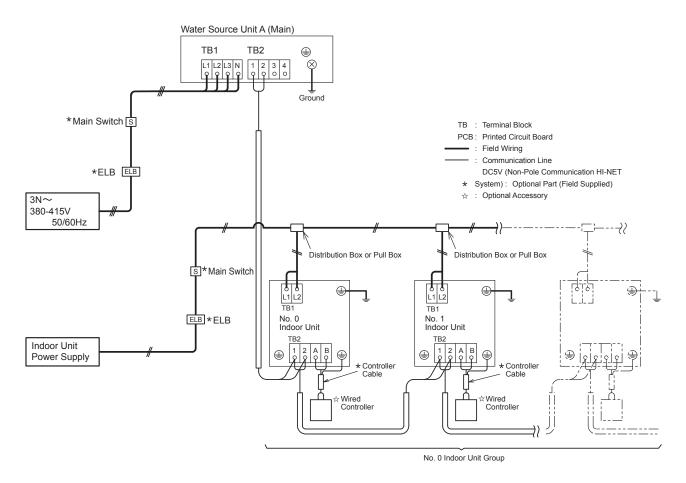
Layout for Electrical Wiring Connection (Heat Pump System)
